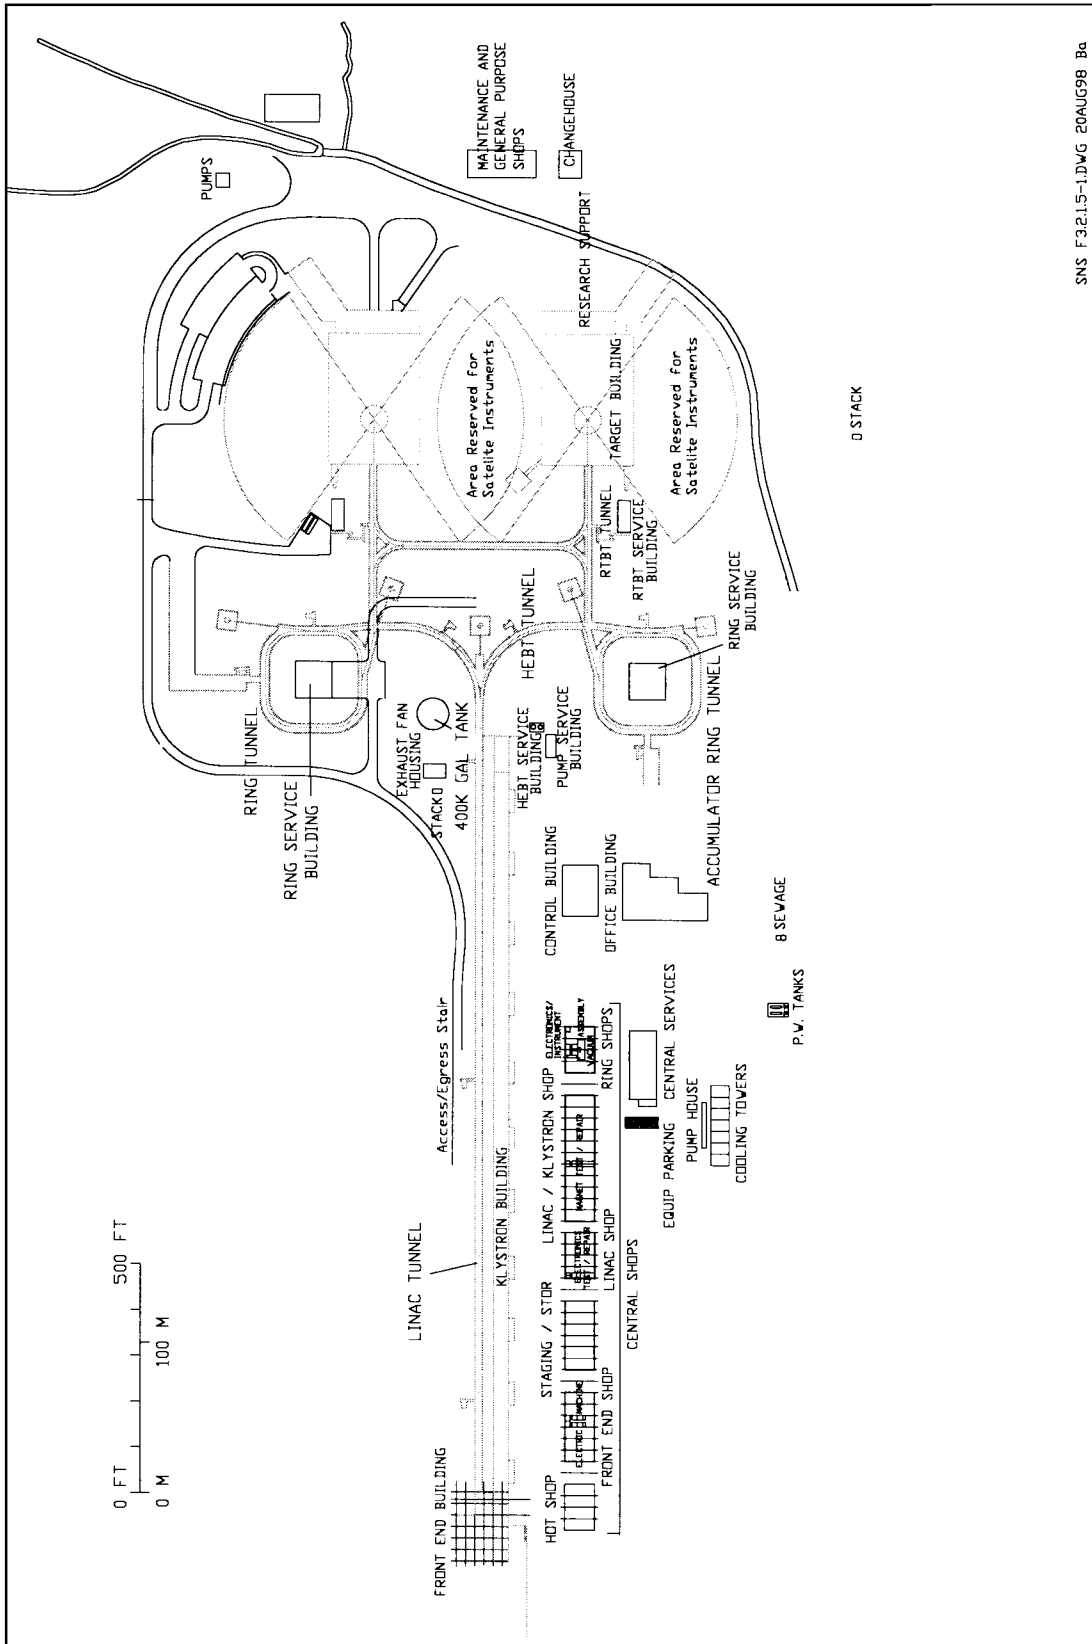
Site plan for fully upgraded facility.
